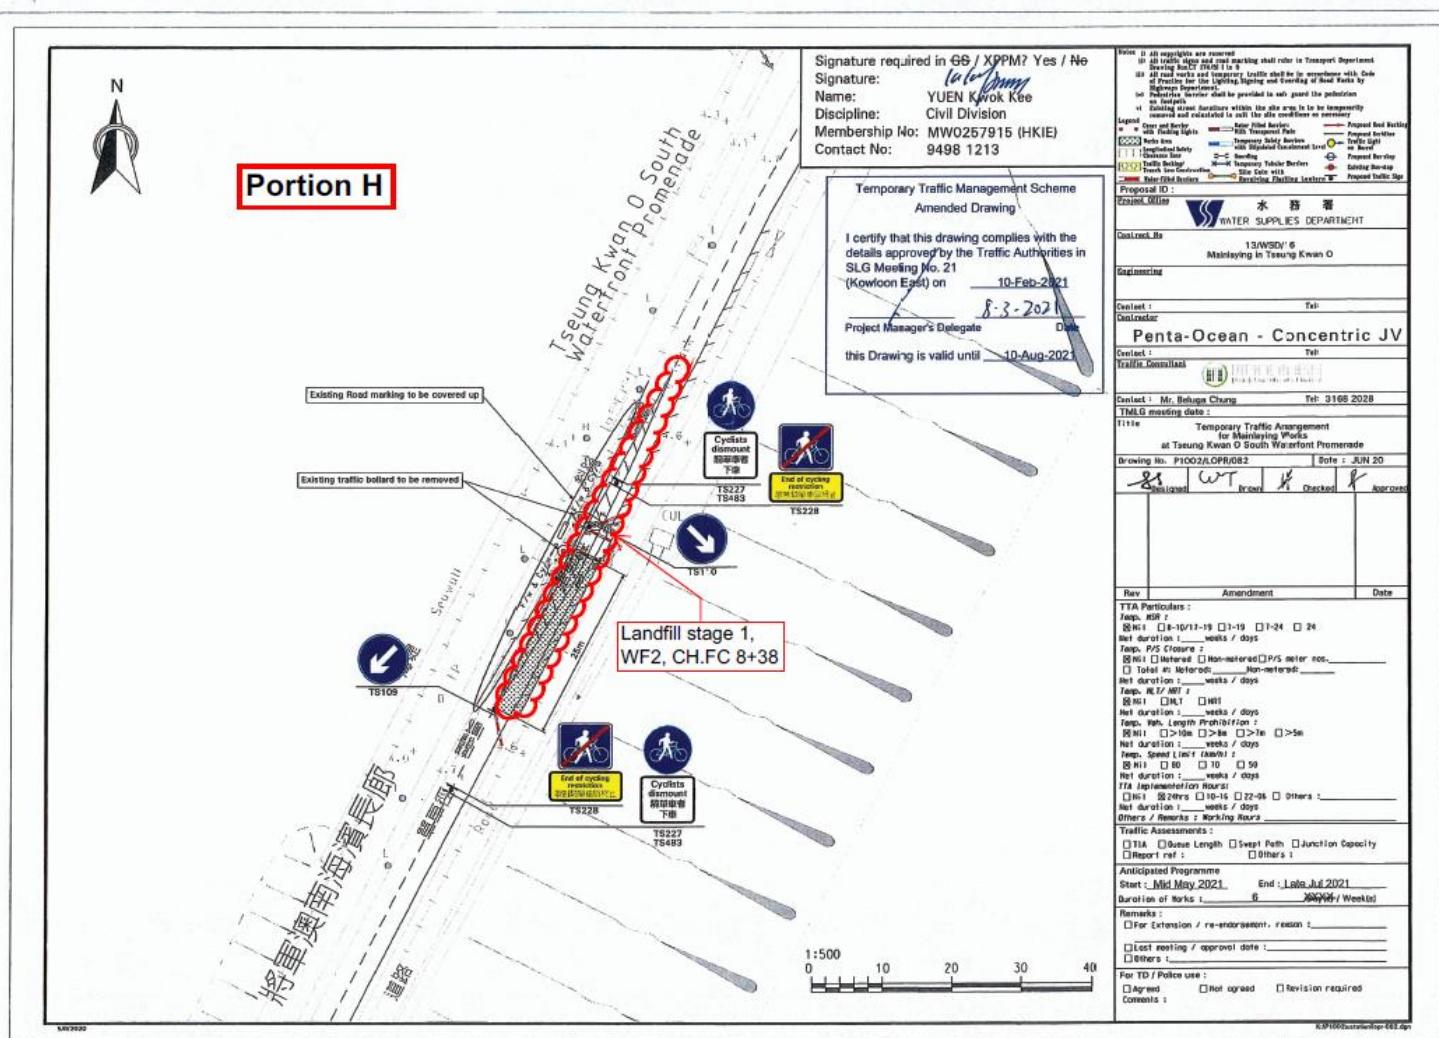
Location Plan – Landfill Stage 1 (Area FC8+38)
